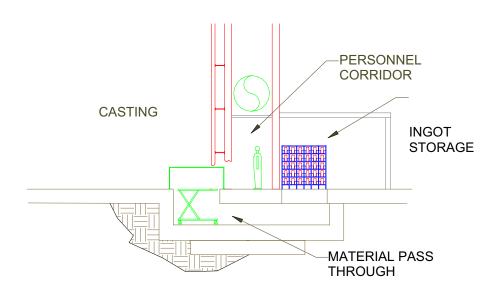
MATERIAL PASS-THROUGH EXAMPLE
